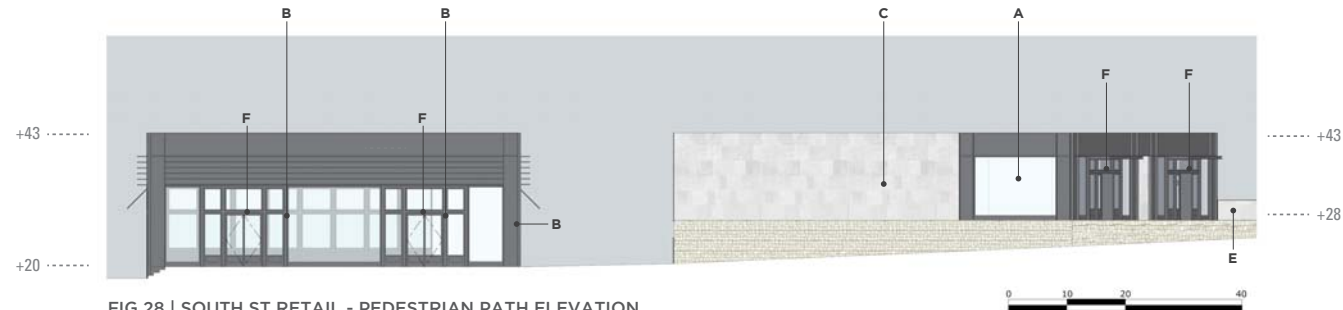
| SOUTH ST RETAIL - PEDESTRIAN PATH ELEVATION
